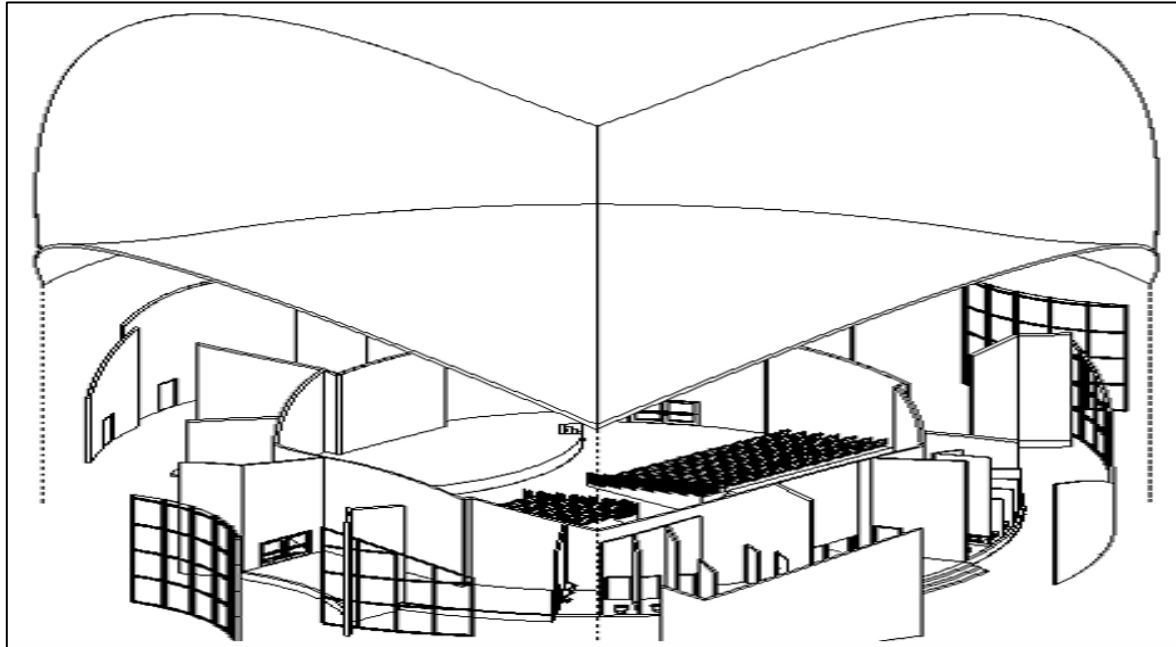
Exploded Axonometric View of the Multipurpose Hall
